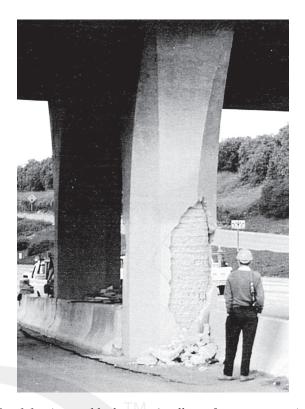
Acceptable damage (spalling of cover concrete) to a bridge column for large earthquake.
